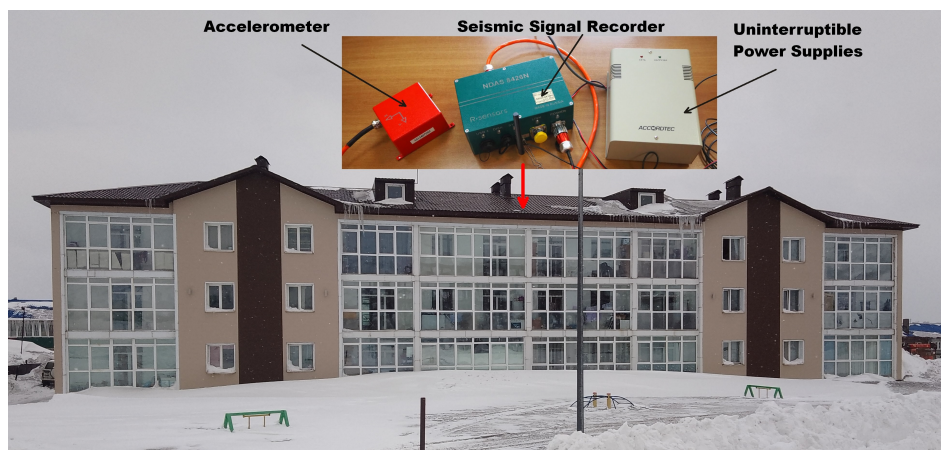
Installation of recording equipment in one of the residential buildings in Severo-Kurilsk.
